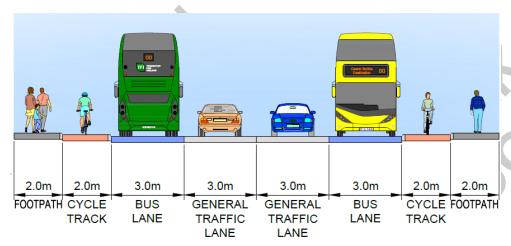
Section 1, Proposed Option 2 - Cross Section A-A
